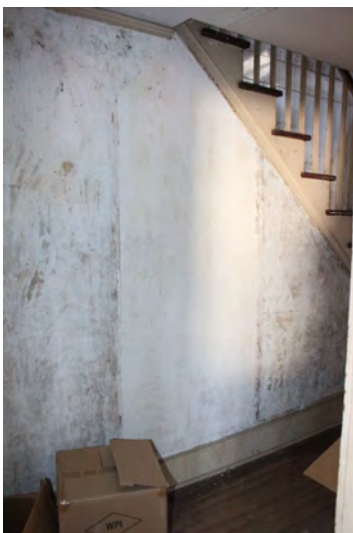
Location of earlier door in 19th century house. (HA, 2015)
